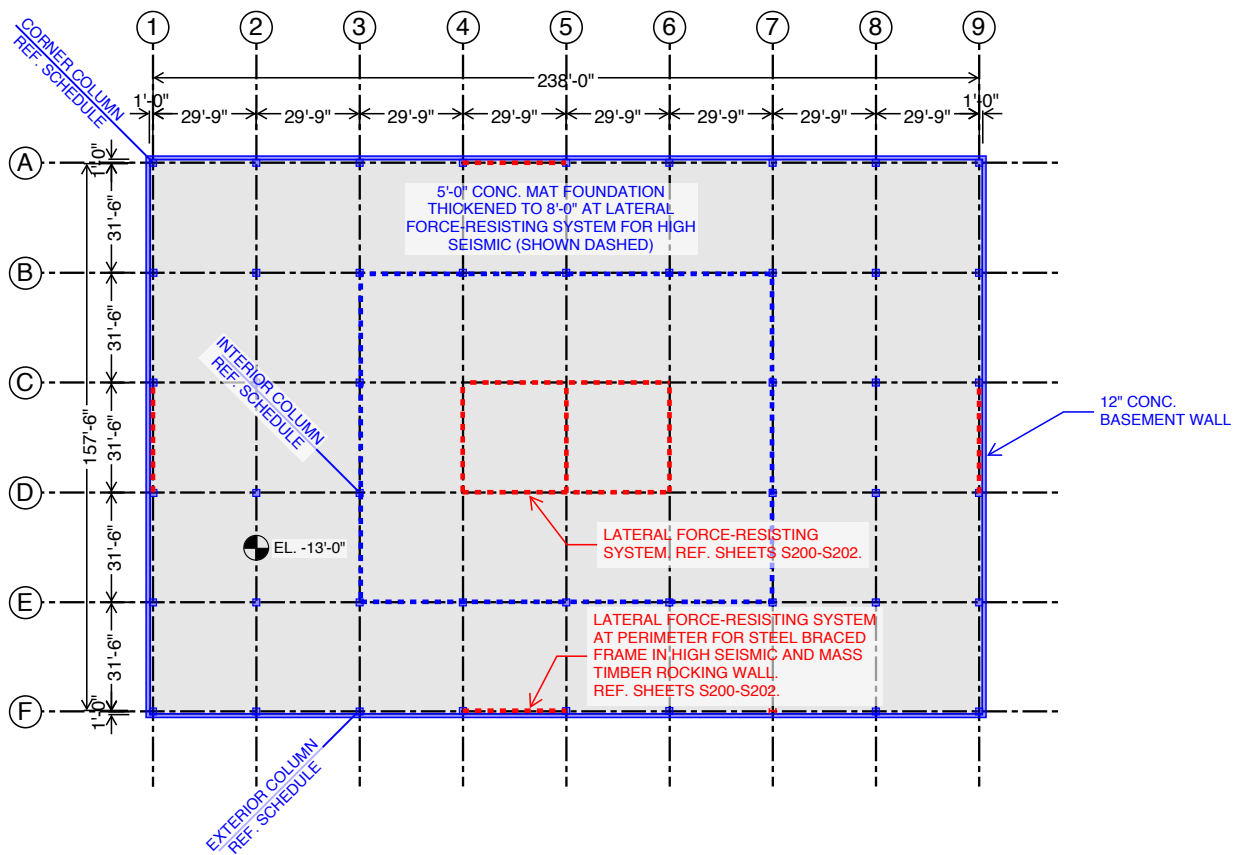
Basement level and foundation plan for the large mass timber office buildings
